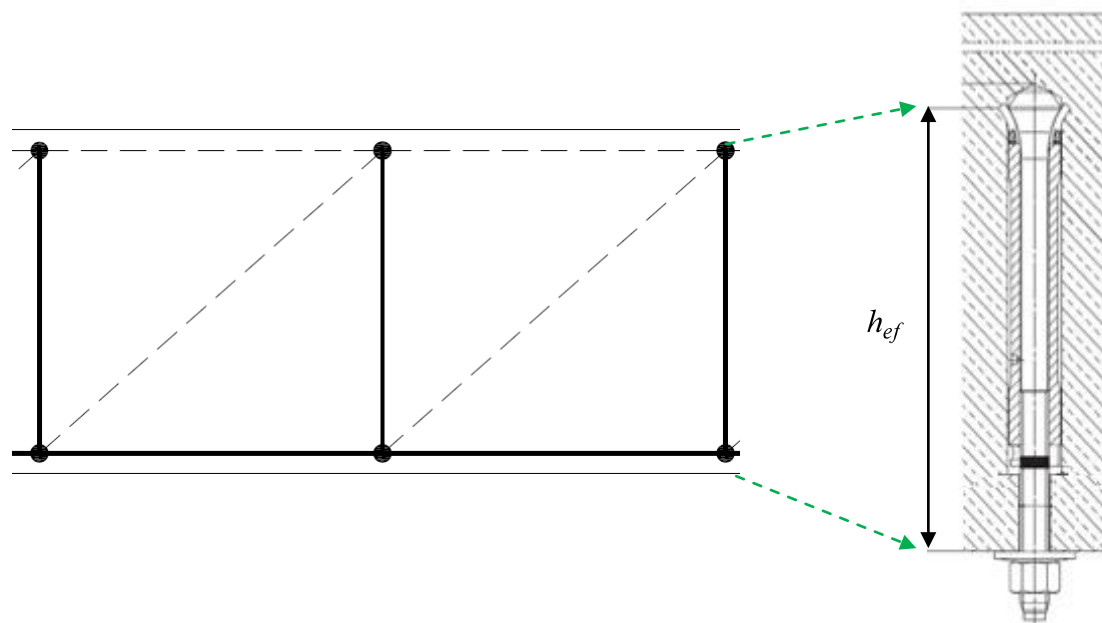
Installation of an undercut anchor. (HILTI, 2009)
